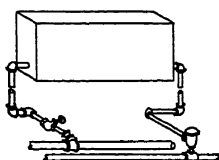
HEATING UNIT WITH VALVES IN BASEMENT
